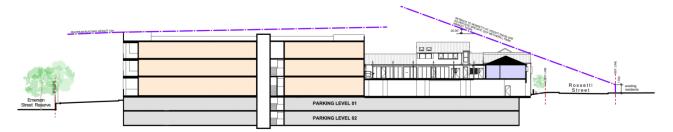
Scenario 2 Retail and commercial development: Progressive setback to Rossetti Street for a development containing retail, commercial and other non-residential land uses.
